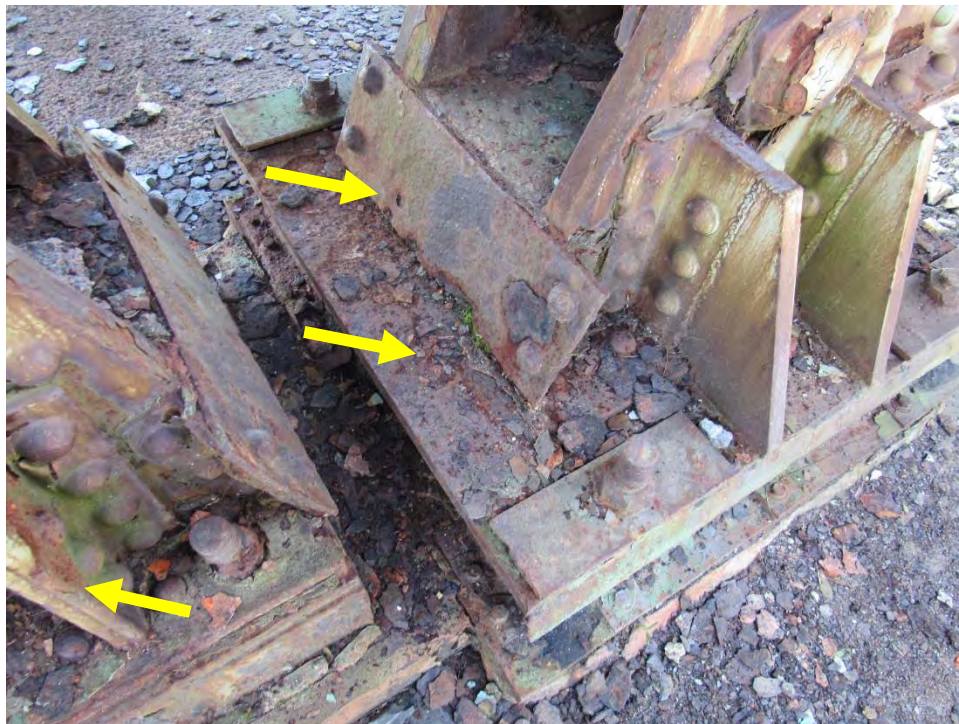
Pier 1 Bearings – Top Plate and Stay Plate Deterioration
